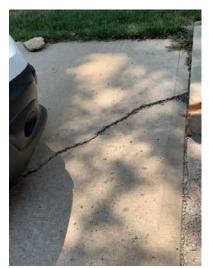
Cracked Sidewalk at SW Entrance
